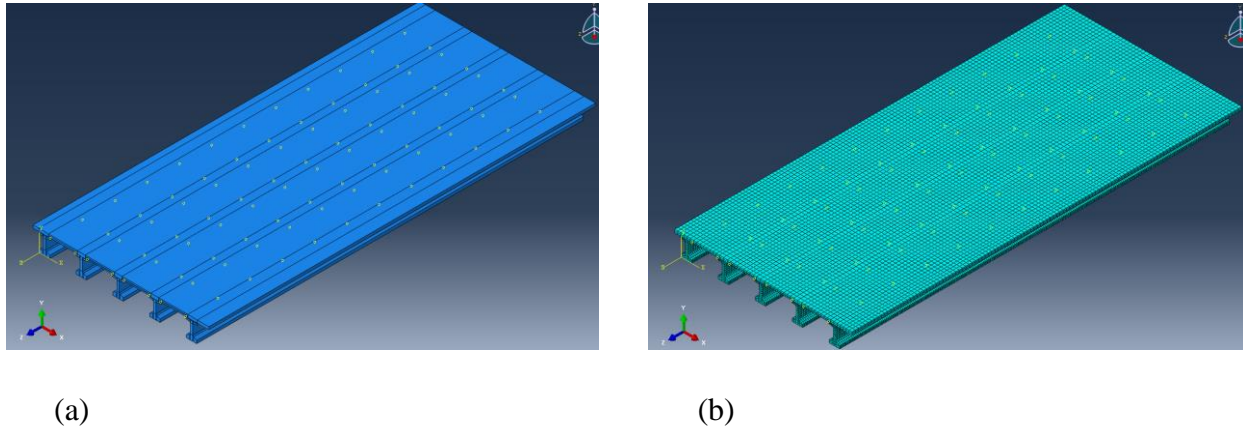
8: Half-scale bridge model: (a) 5 girders with panels and deck; and (b) 5 in. native mesh
